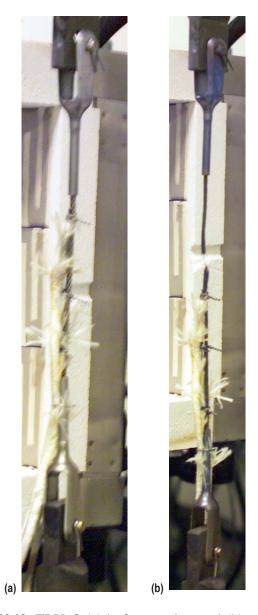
5369–ELV–8 (a) before testing and (b) after testing.
